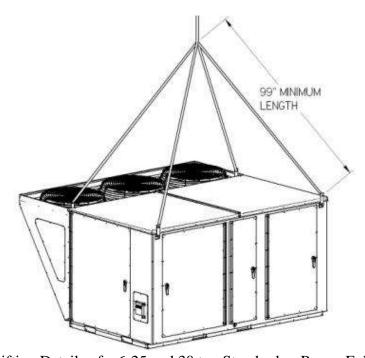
Lifting Details of a 6-25 and 30 ton Standard or Power Exhaust Unit
